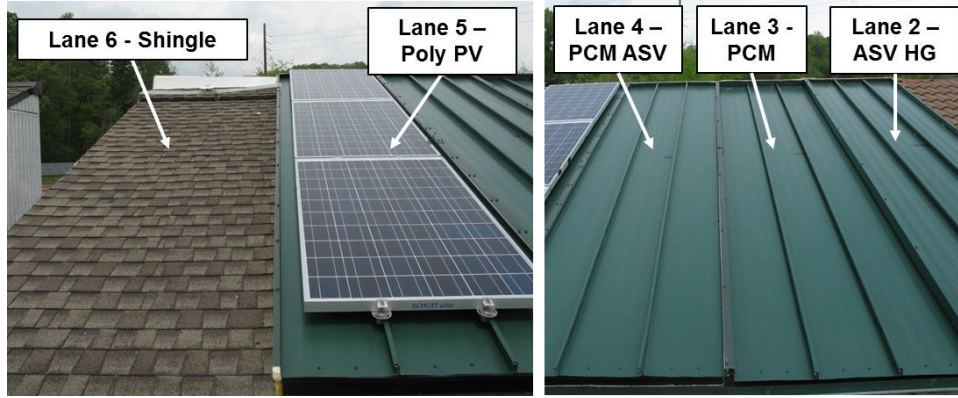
Control asphalt shingle roof (left) and the test roofs (right).
